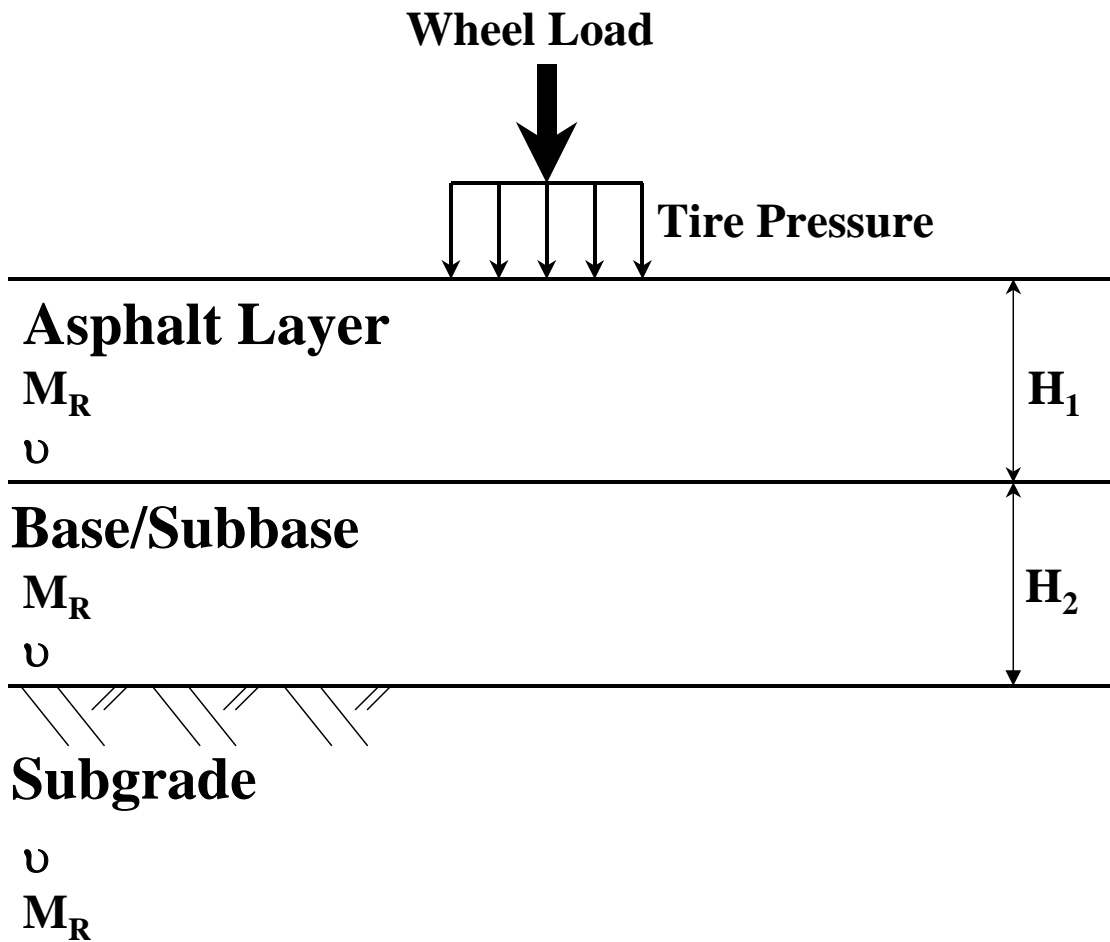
Elastic Layer Model Diagram for a Typical Pavement Section
